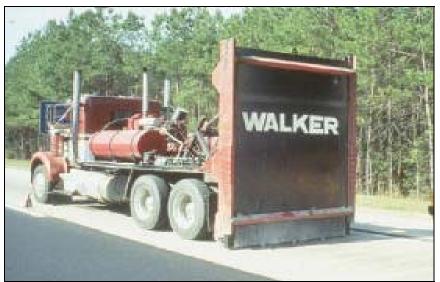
Guillotine Equipment Used to Break Existing Concrete Slabs.
